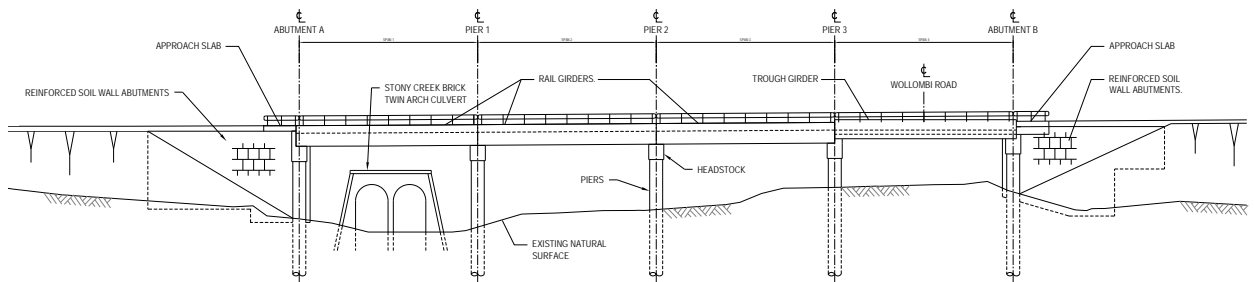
Proposed Wollombi Road/ Stony Creek Underbridge Design Schematic
